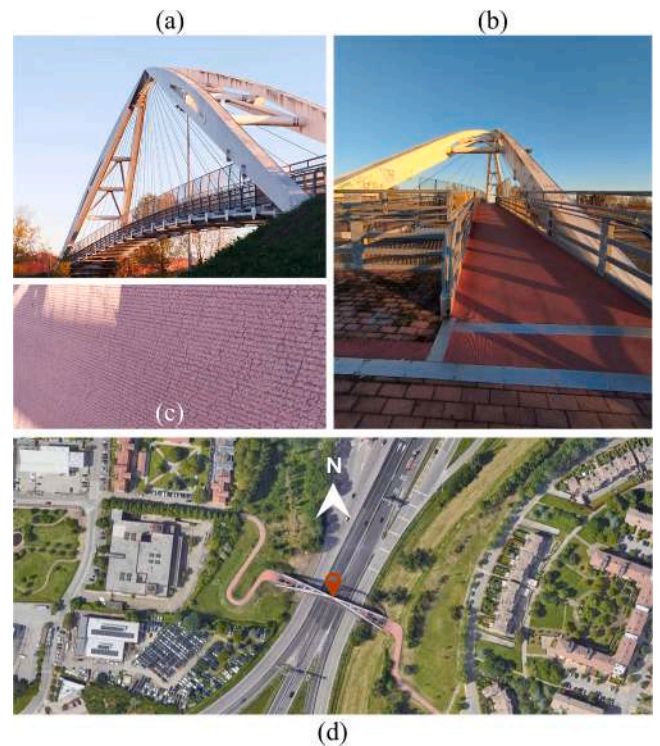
Footbridge details. Side view (a), front view (b), pavement detail (c), and satellite image with its surroundings (d).
